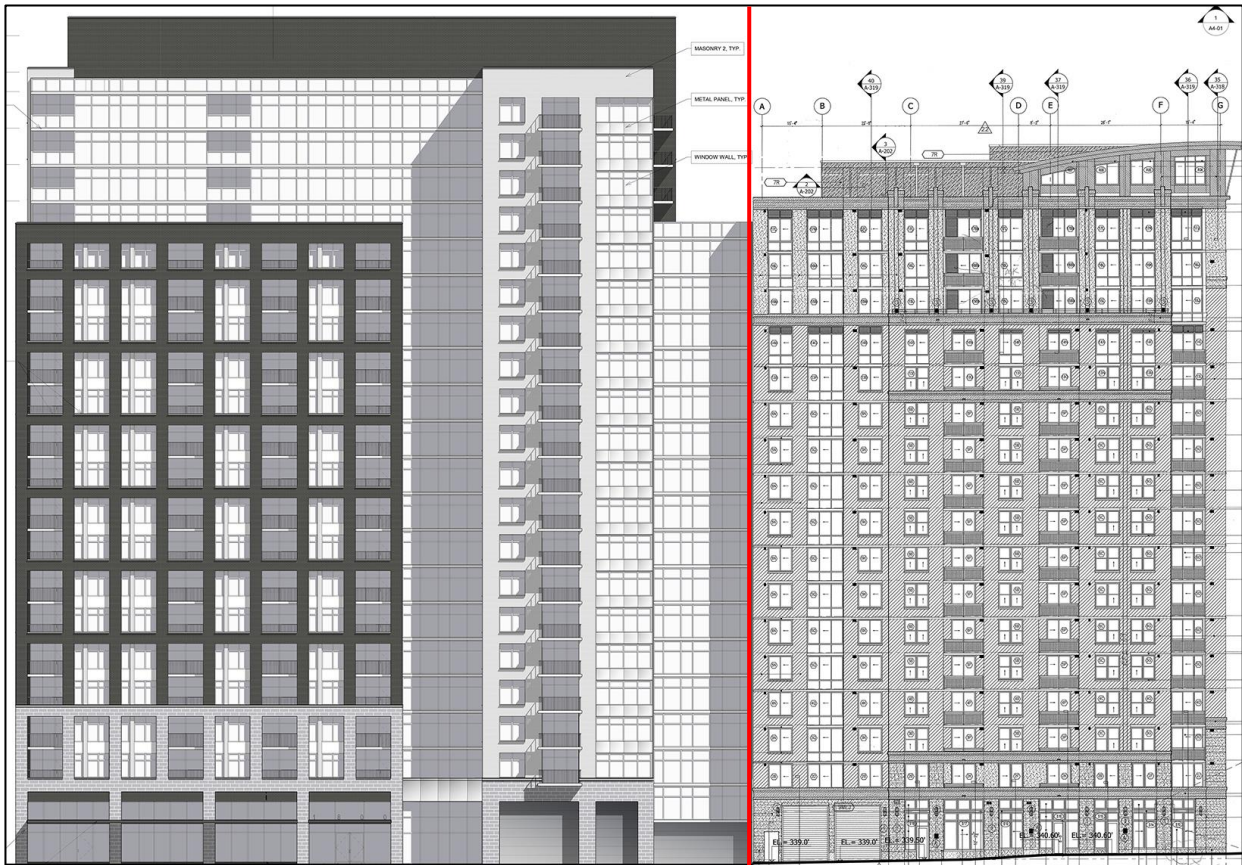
Proposed Ripley II building elevation with connection to existing Solaire Silver Spring building
